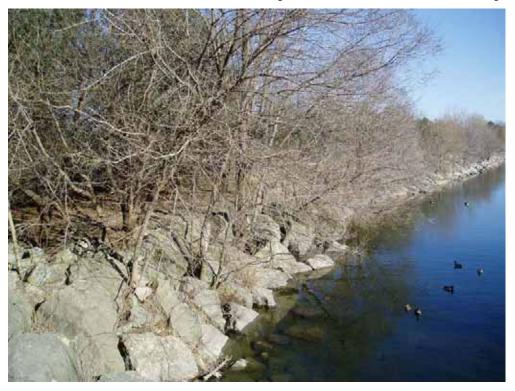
R.K. MacMillan – Armourstone protection at creek on west side of park
